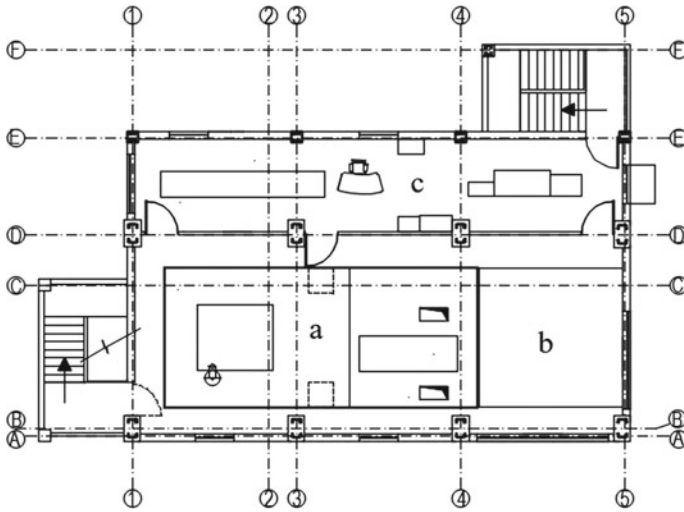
Plan at first floor level a Generator slab, b Grated area, and c Control room
